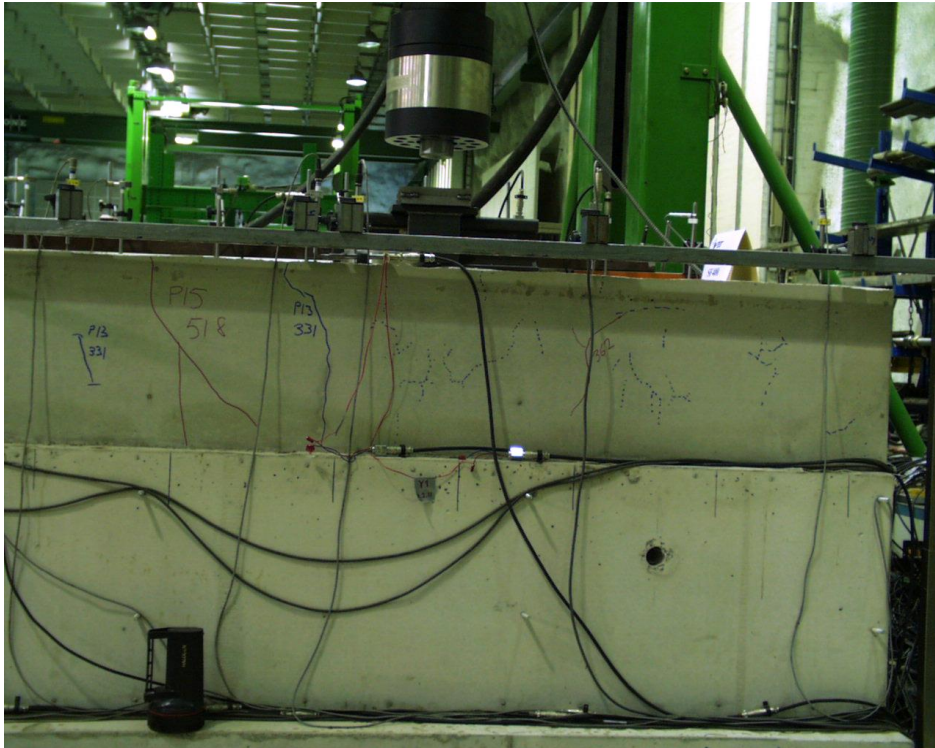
PF400:15. Cracking pattern in Western tie beam after failure.
